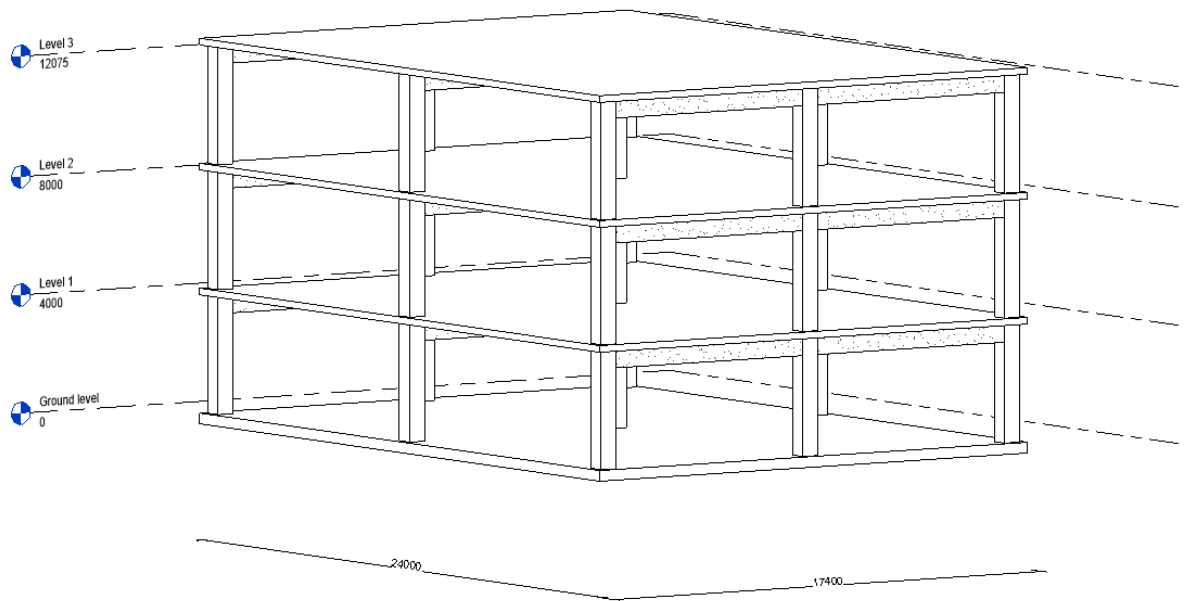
3D view of building without walls modelled in Revit. View direction from South-East toward North-West.
